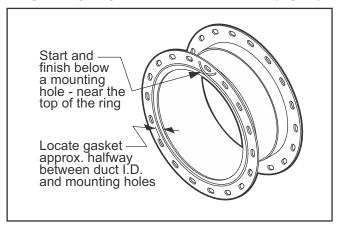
Gasket installation for welded rings 108"-120" dia.
